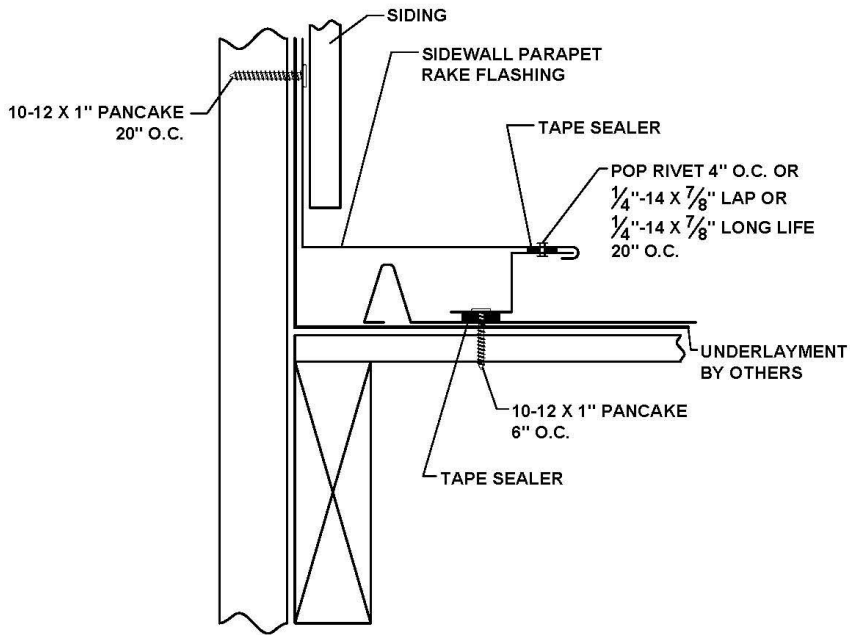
Sidewall/Parapet Fixed Rake Flashing Detail
